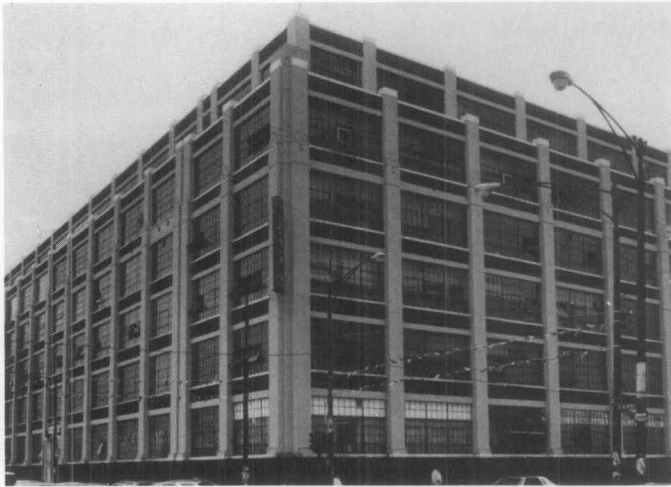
a. A six-story concrete manufacturing building prior to the replacement of the steel pivot windows. Photo: Charles Parrott.
